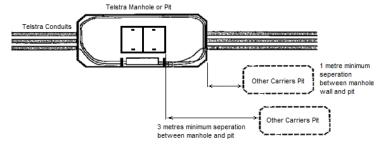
Typical Installation of Another Carrier's Pit Adjacent to a Telstra InfraCo Manhole
